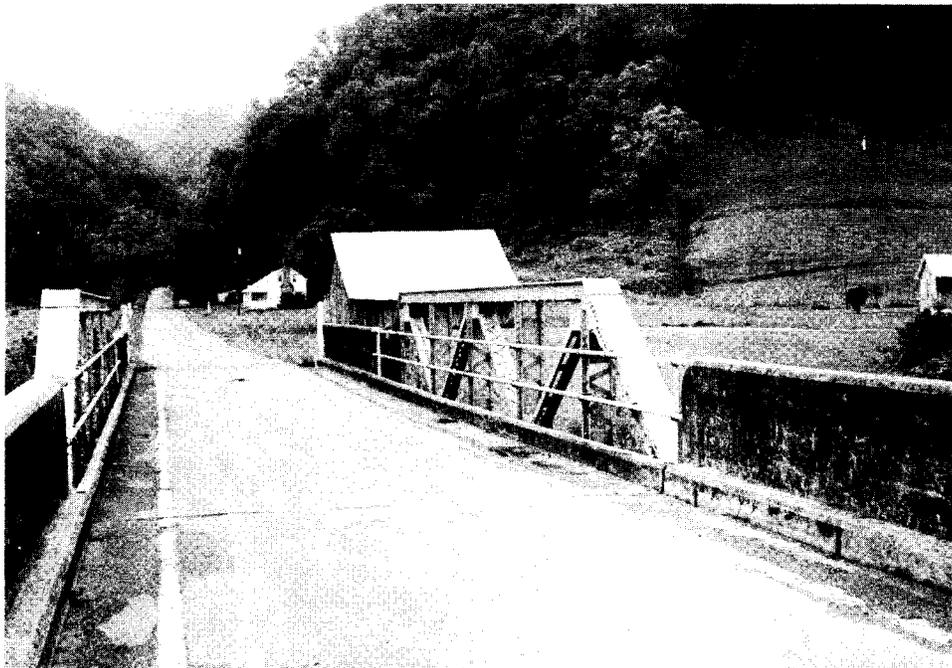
Pony truss span combined with two concrete spans in Scott County, over the Clinch River.
